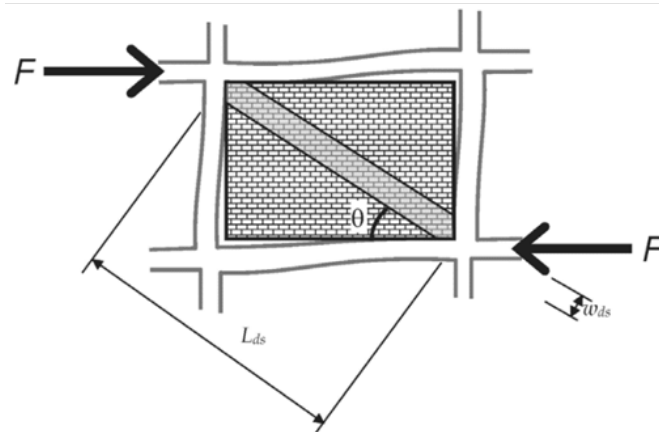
Dimensions of the Equivalent Diagonal Strut Model for Masonry Infill Walls.
